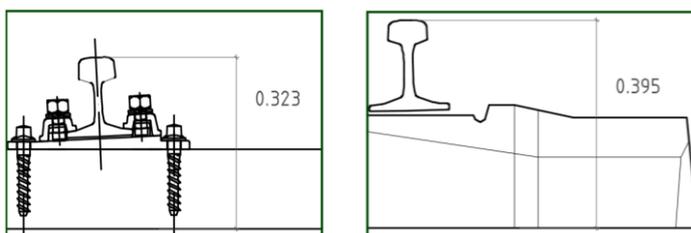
Rail track fastening ПІАК 68II and SKL14
